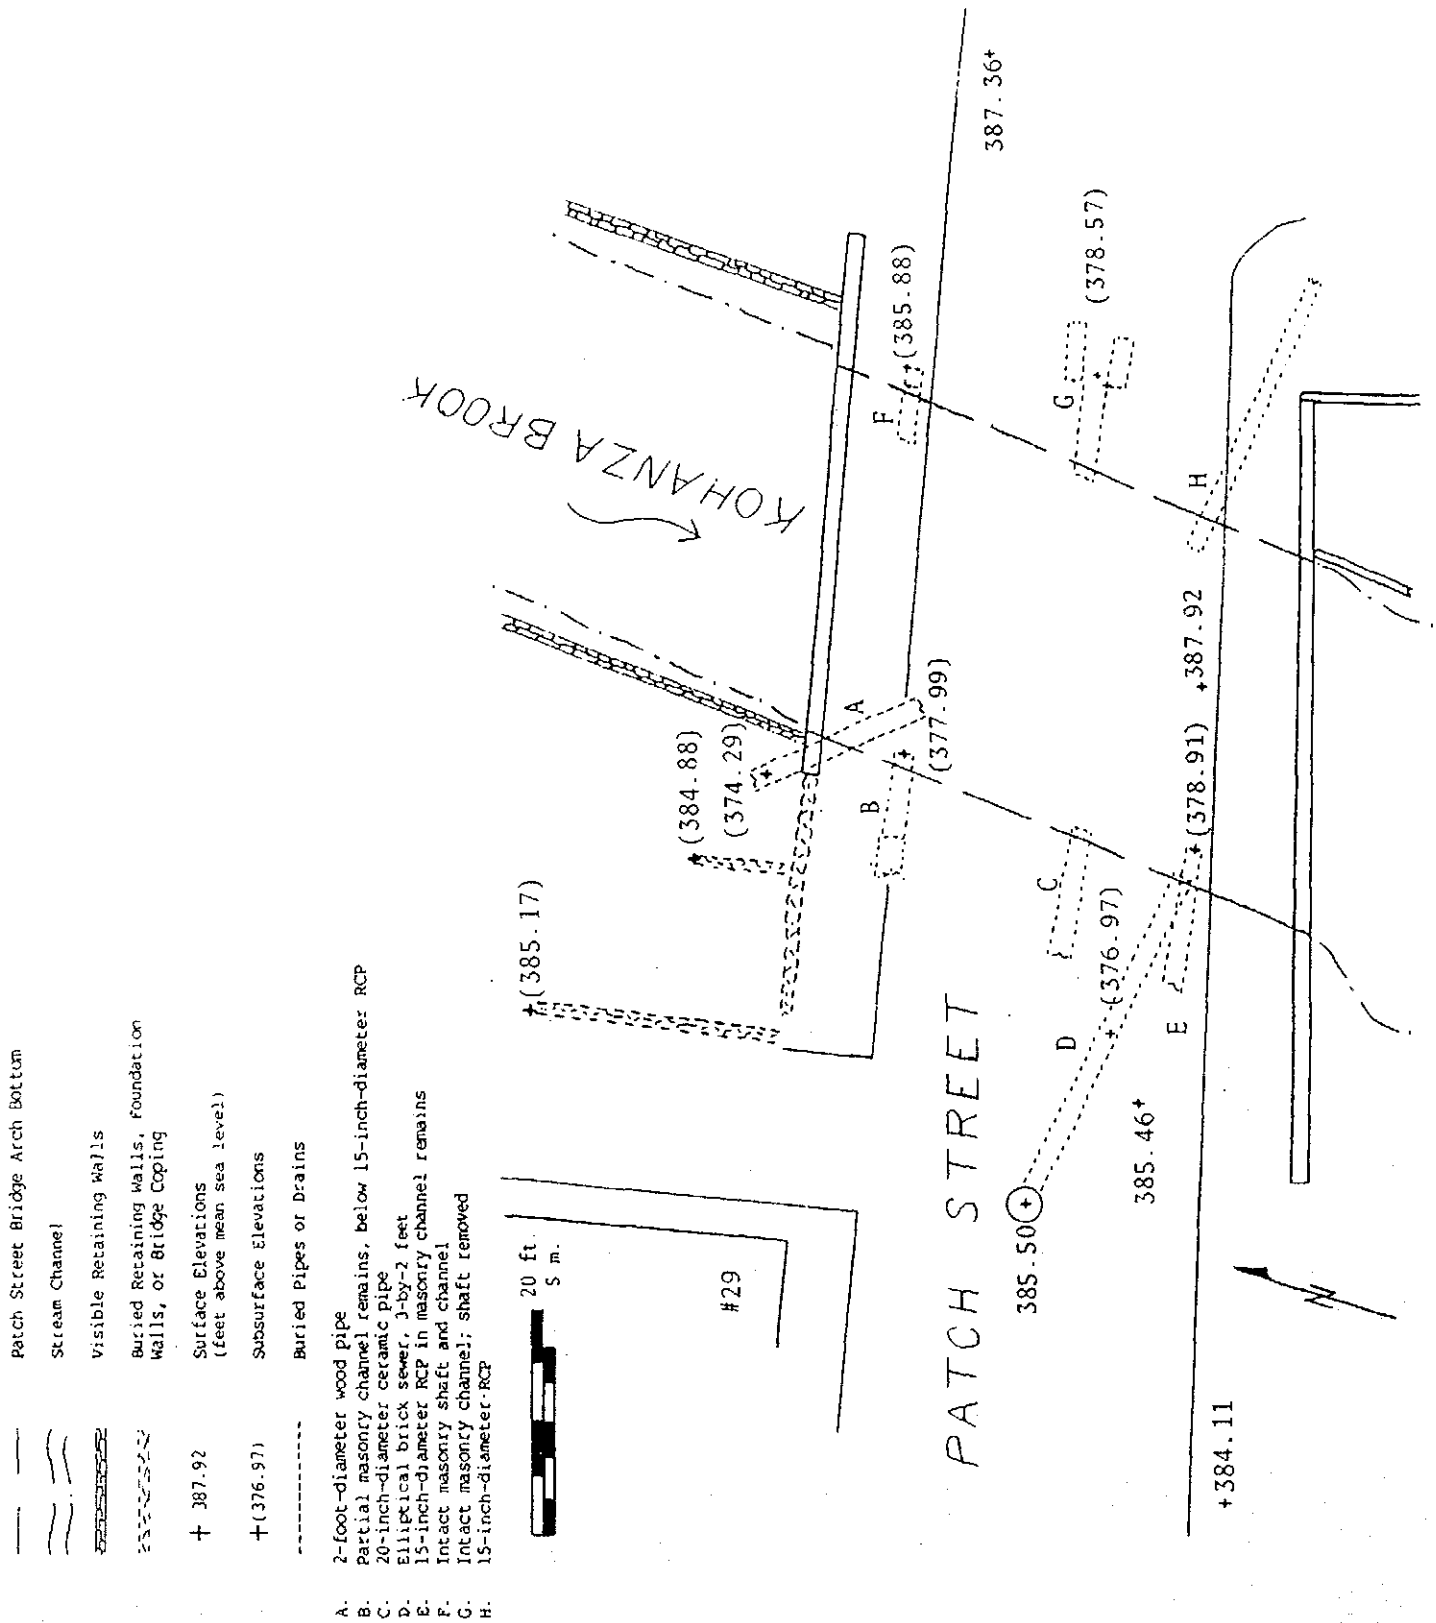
BURIED FEATURES AT PATCH STREET BRIDGE
